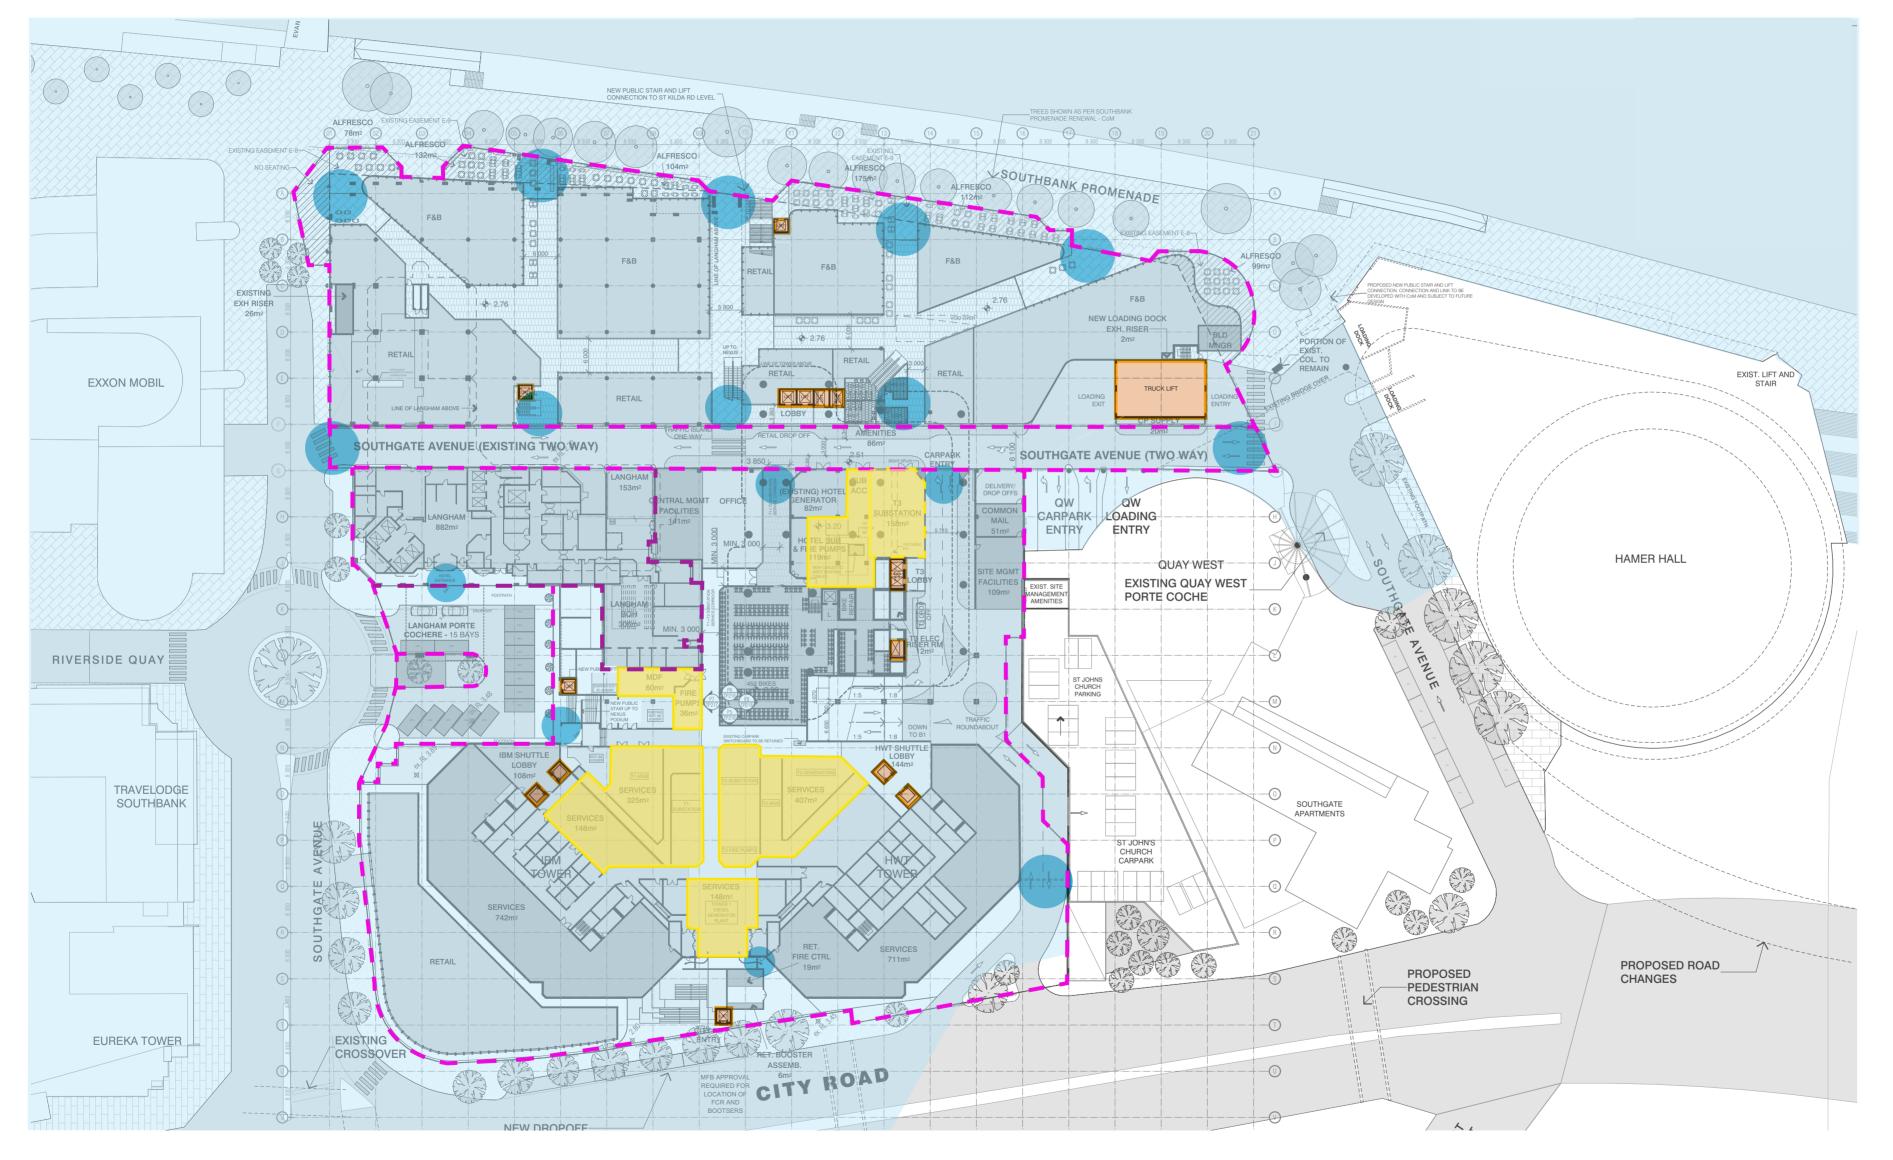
DIAGRAM HIGHLIGHTING EXTENT OF AHD4.04 (FREEBOARD LEVEL) AND FLOOD SENSITIVE ELEMENTS WITHIN EXISTING AND PROPOSED REDEVELOPMENT ZONE.
